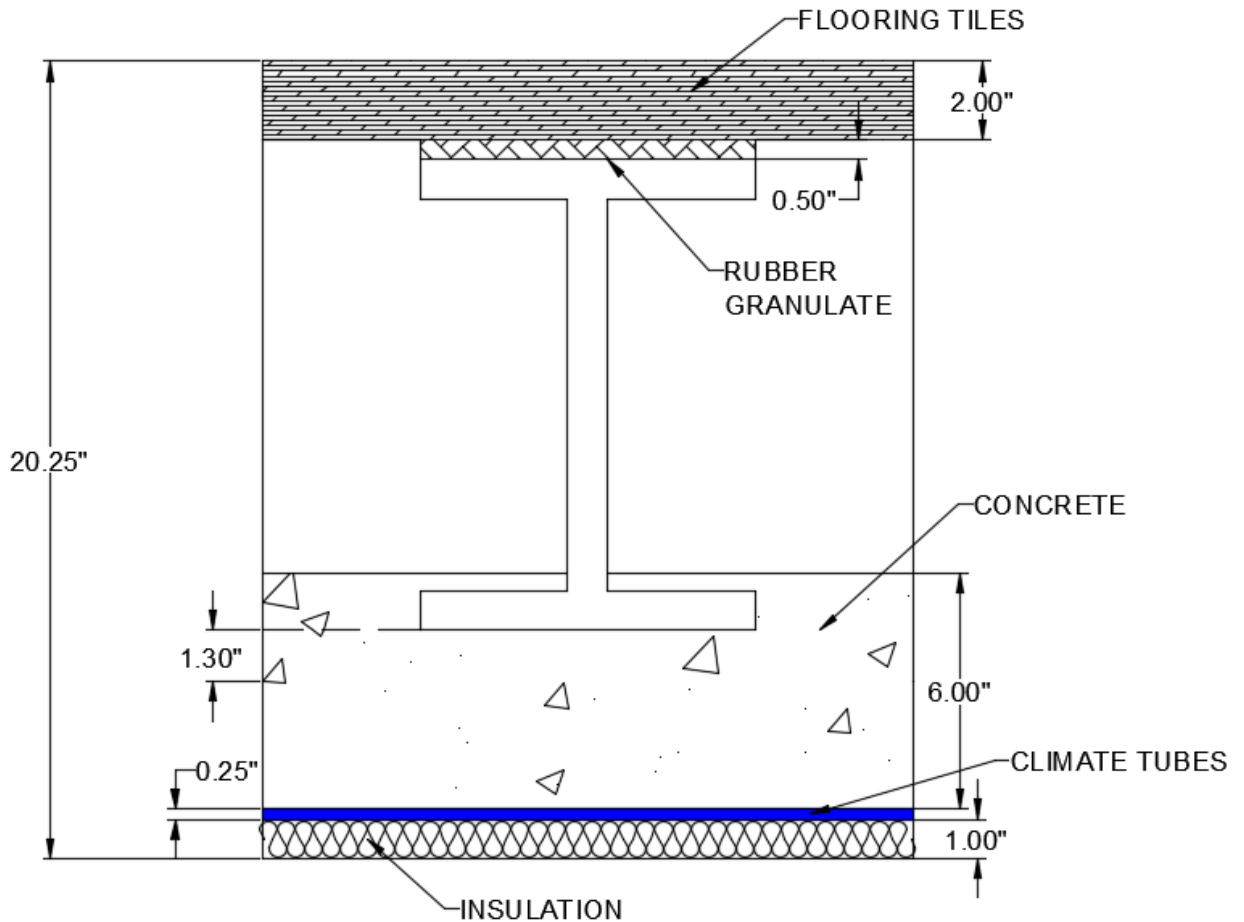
Slimline Floor Framing System Cross-Section with Climate Tubes Below
